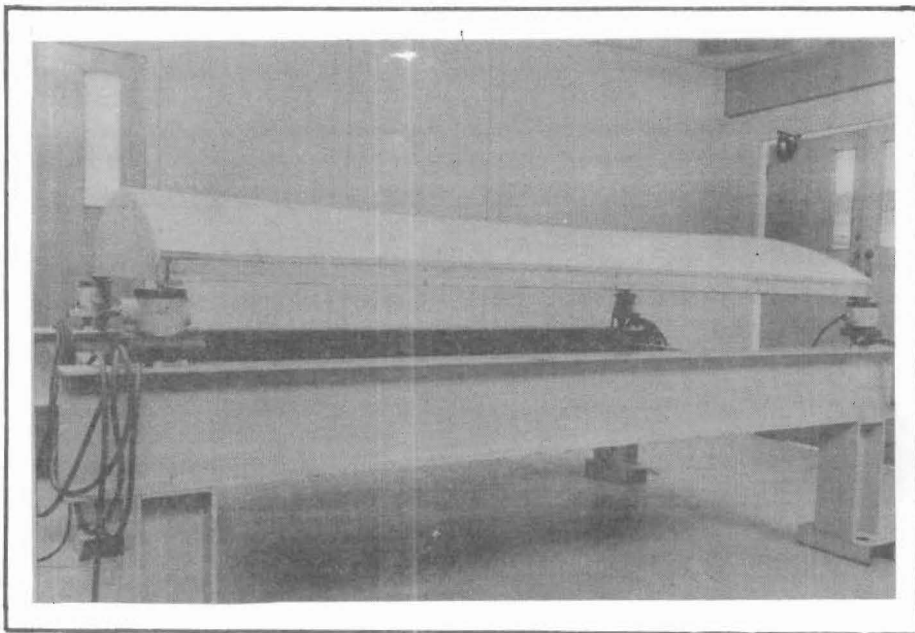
Showing deformed shape of nailed shell after removal of air bag, dial gauges and reaction platform.
